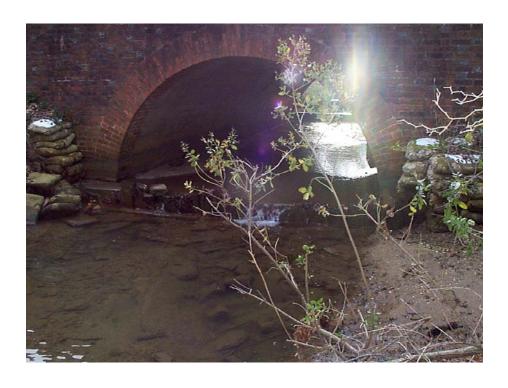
Bridge over Wormley Creek with Wormley Pond in background. Irish ramp was set under upstream edge of bridge at the base of the dam.
